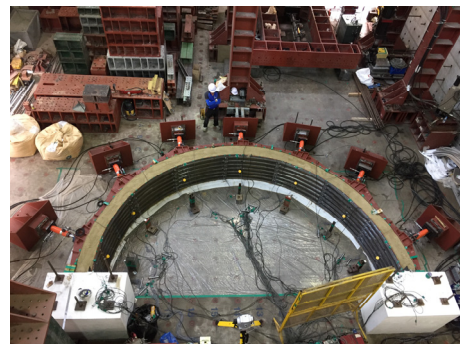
Full-Scale Specimen of Corrugated Steel Plate Structure
